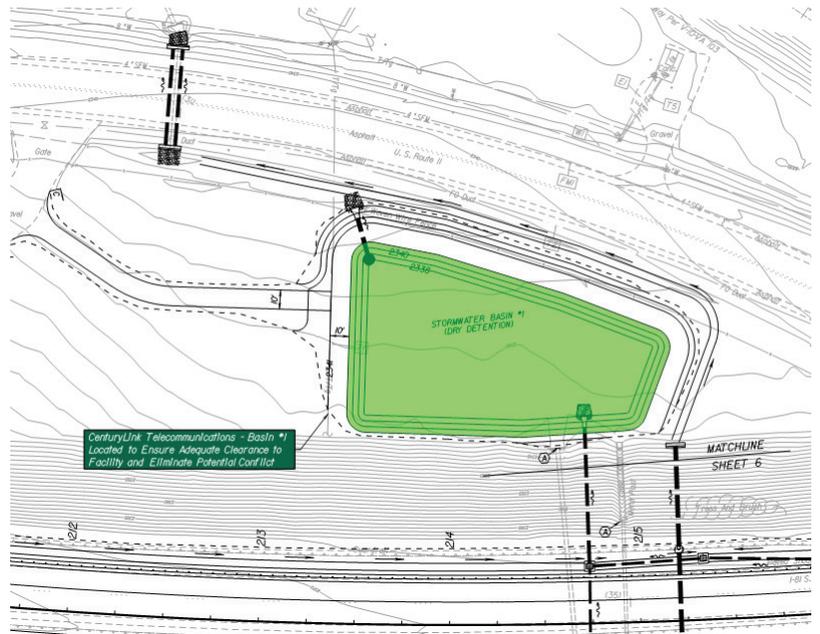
(e)(2): Proposed Stormwater Facility
